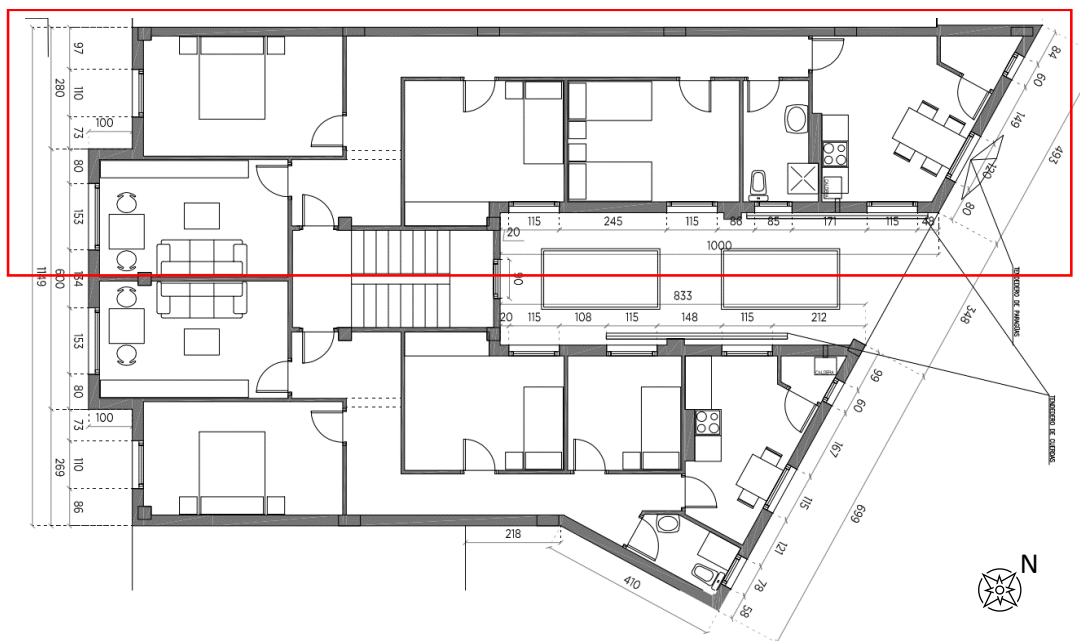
Third-floor plan. The apartment object of calibration (3R) is highlighted.
